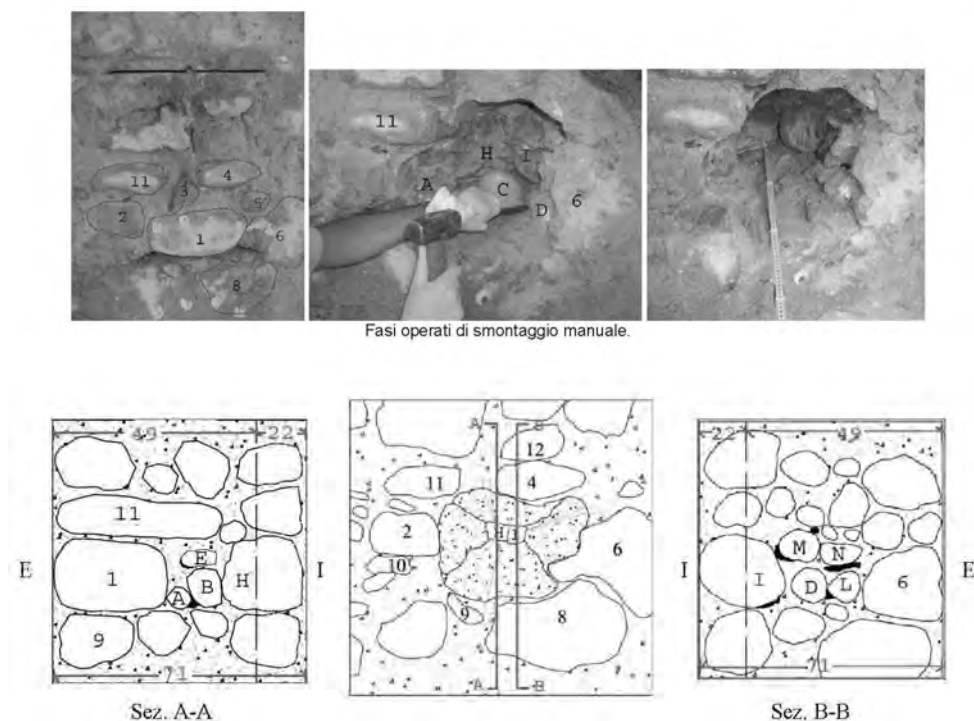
Survey of the wall section by a small demolition of the external masonry leaf.
